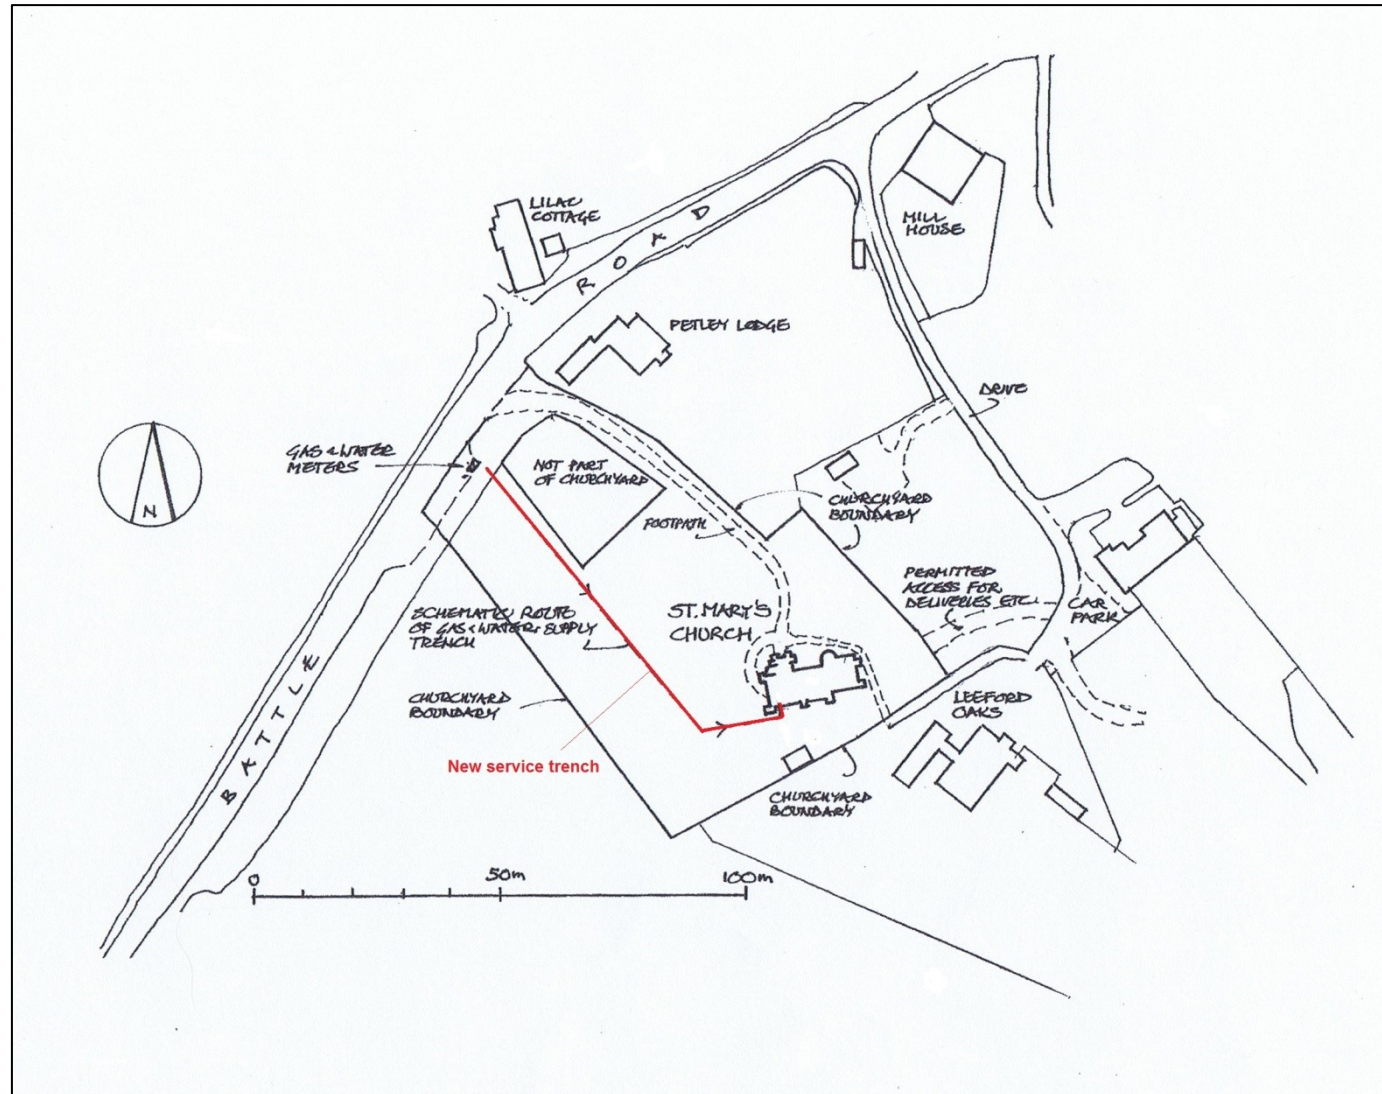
Whatlington Church: Plan showing location of service trench to west of Church
